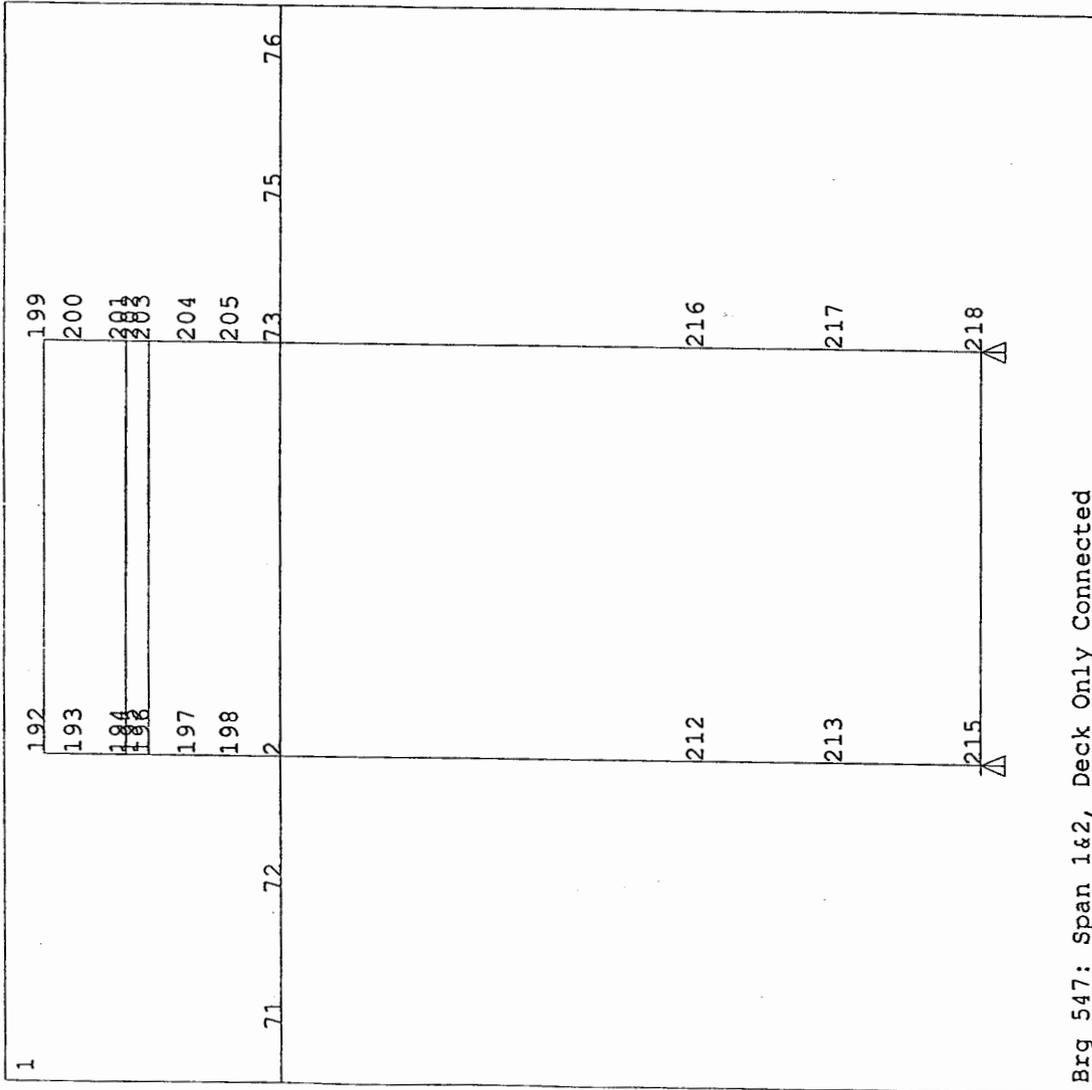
Bridge #547: Spans 1 and 2 - Connection Detail Node Plot
